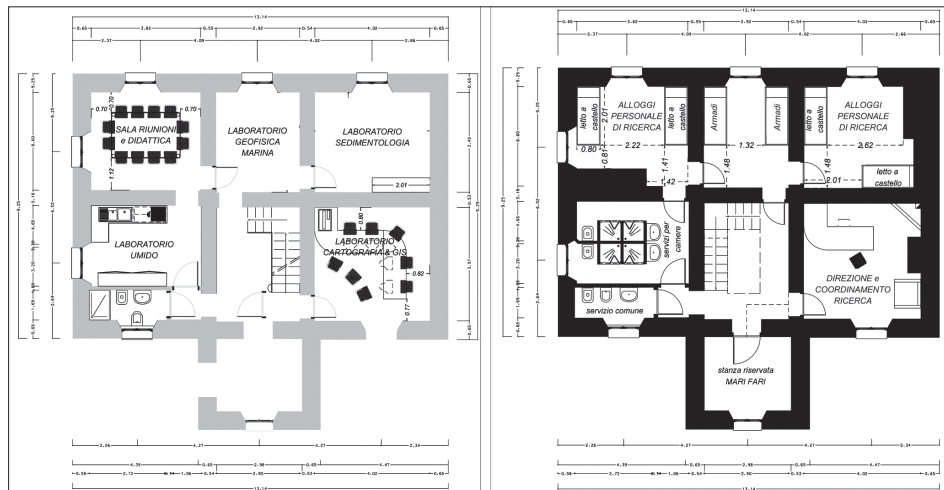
Plan of the Lighthouse, ground floor and first floor.
